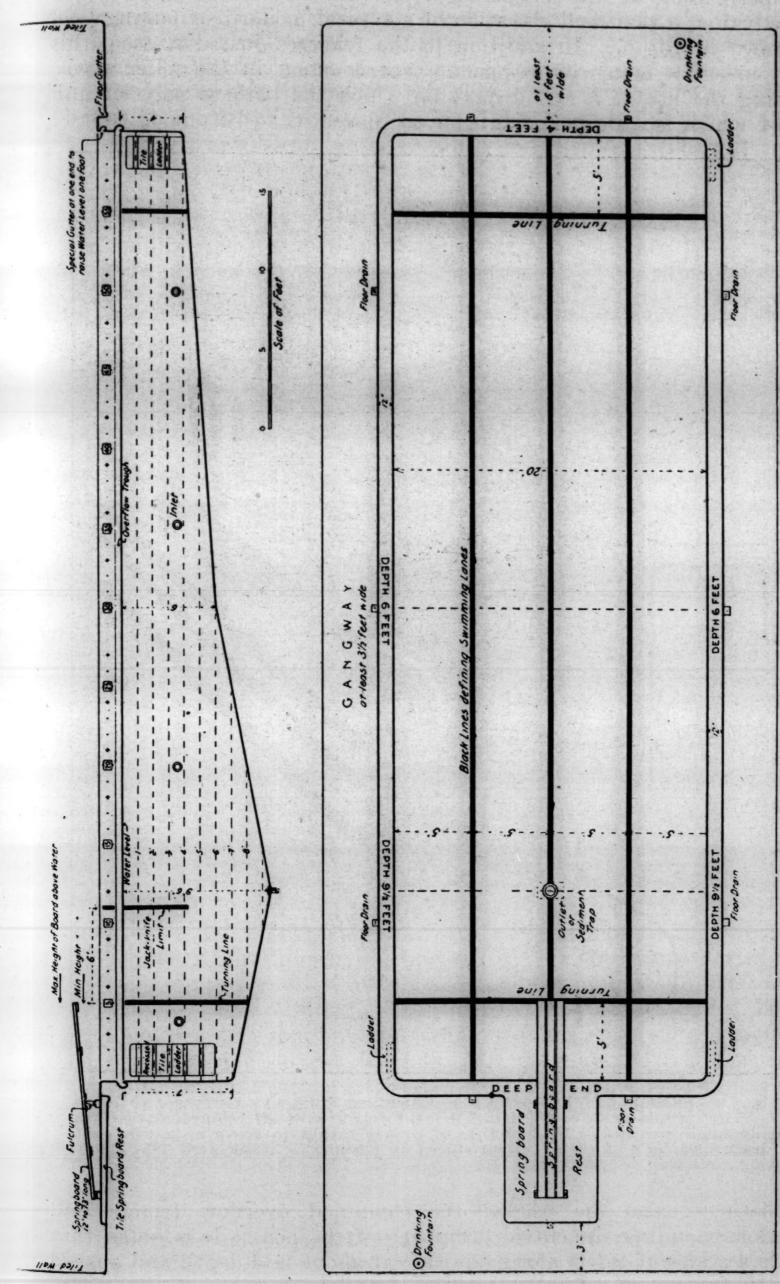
Fig. I. PLAN AND ELEVATION OF TYPICAL SWIMMING POOL. "The pool is planned as a standard for swimming and diving events. It is, therefore, sixty feet long and twenty feet wide, has a modern spoon-shaped bottom, is divided into four swimming lanes of equal width with turning lines at both ends and has the jackknife limit and distances marked on the sides. The relative position of the diving board has also been indicated in diagrammatical form." (Reproduced by permission Associated Tile Manufacturing Company, Beaver Falls, Pa.)
